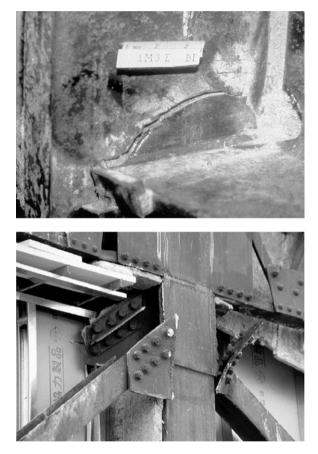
Fracture in beam-to-column connections in the Northridge earthquake (*top*) and web tear-out in bolted brace-to-column connections during the 1995 Kobe earthquake (*bottom*).
